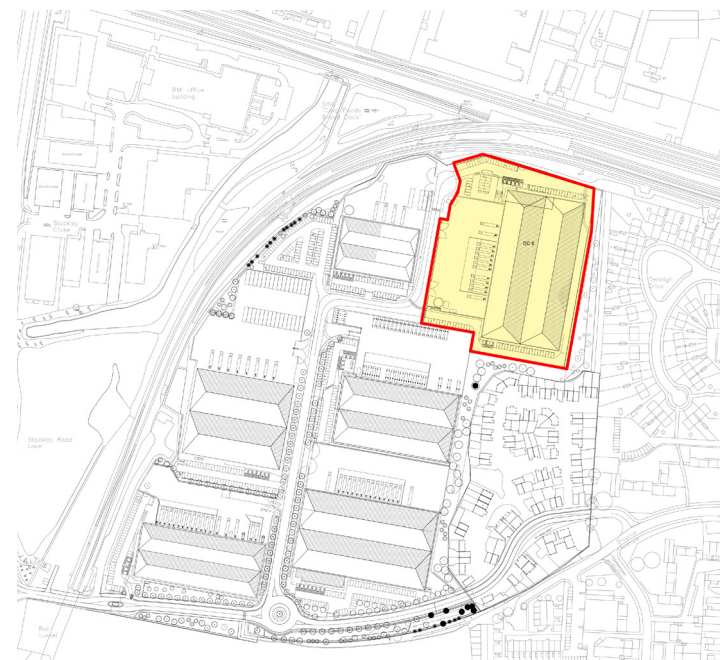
IMAGE ABOVE: EXISTING SITE PLAN SHOWING UNIT LOCALITY
